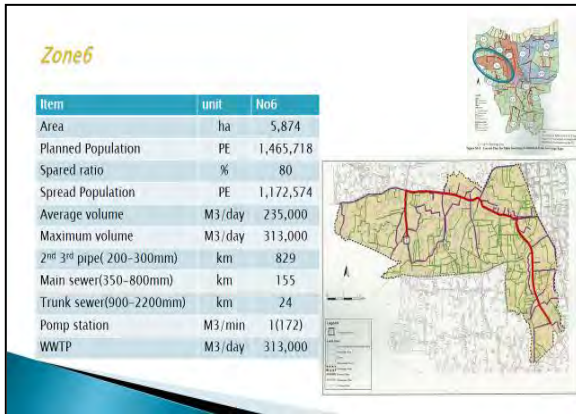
Layout Plan for Main Sewerage Facilities in East Sewerage Zone
